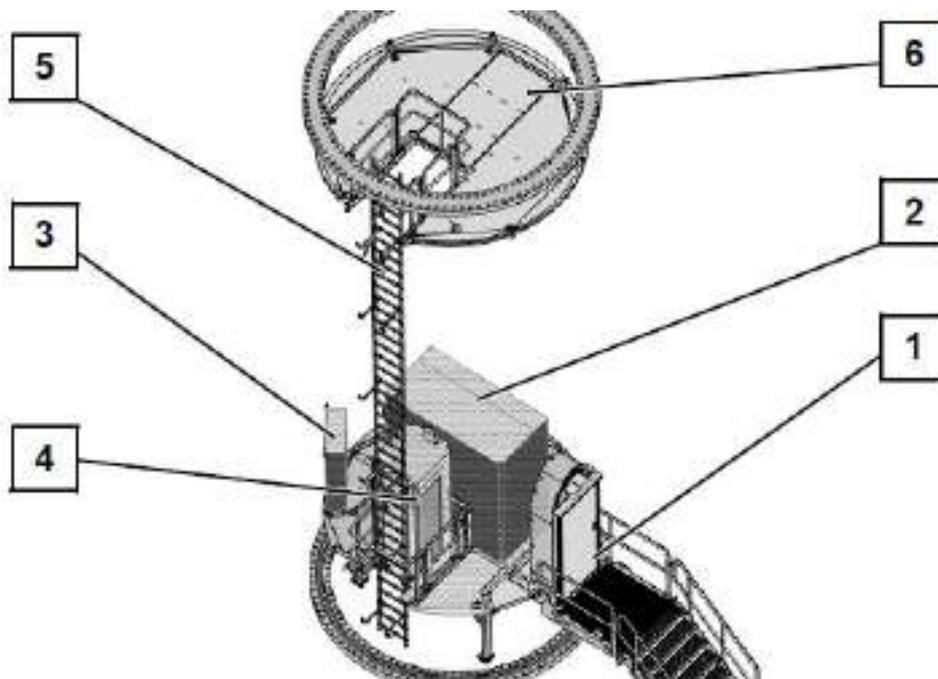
Overview of the bottom section in a tubular steel tower, tower plates not shown
